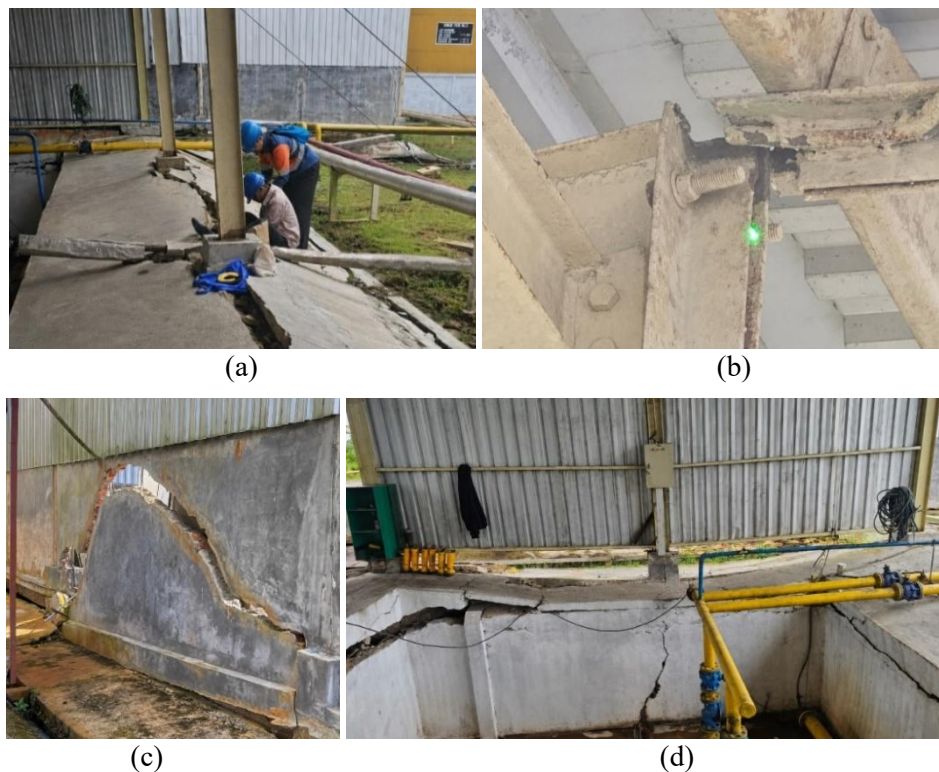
Representative field damage: (a) cracked and sloping floor; (b) distress at a structural connection; (c) wall collapse associated with differential settlement; and (d) cracking and separation around a settled facility component.
